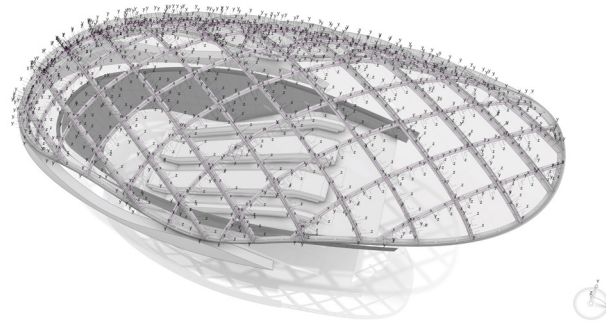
Engineered Model of Pavillon de L'eau Design Proposal
